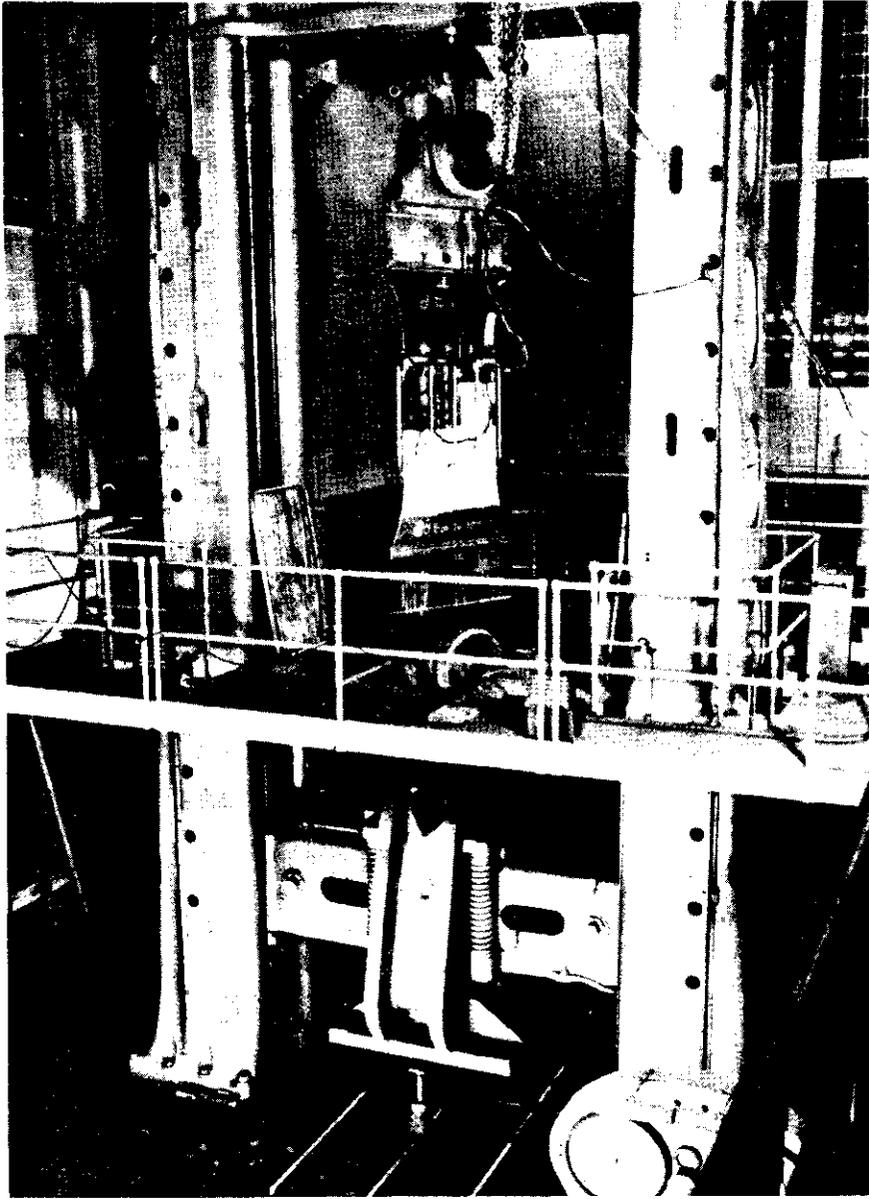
Typical Specimen Mounted in 2,400,000-lb. Testing Machine and Ready for Testing.
